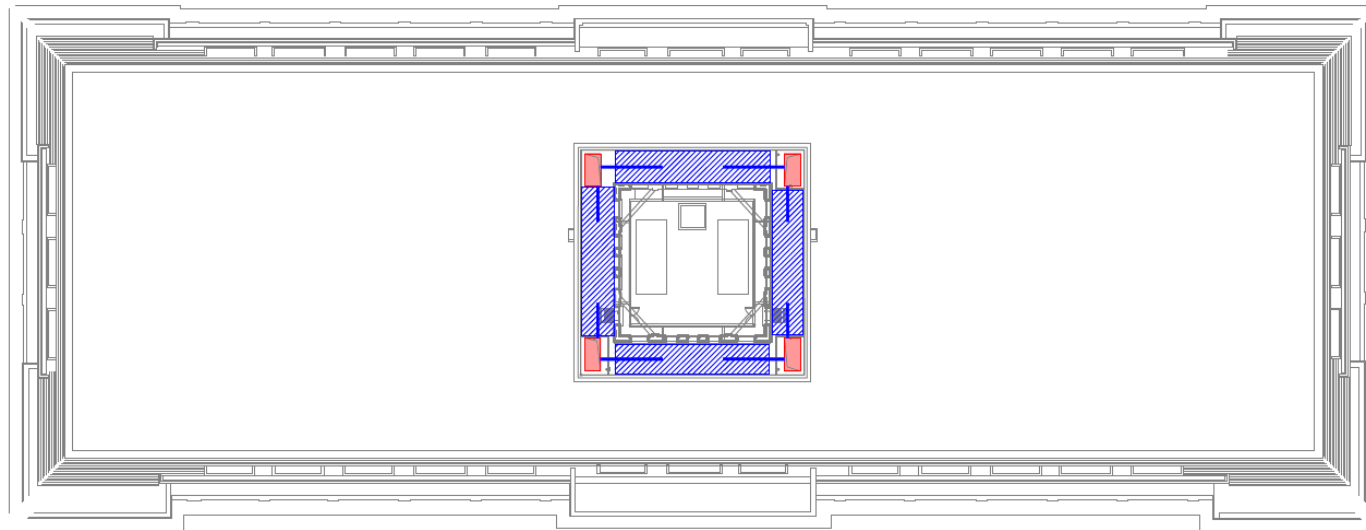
Existing roof plant areas to be retained – 10th Floor
